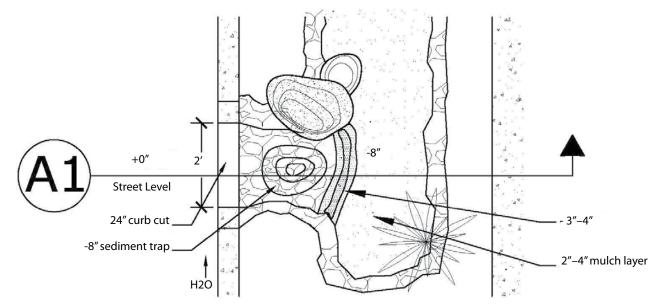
Plan view of sediment trap for curb cut with rock-lined basin.
